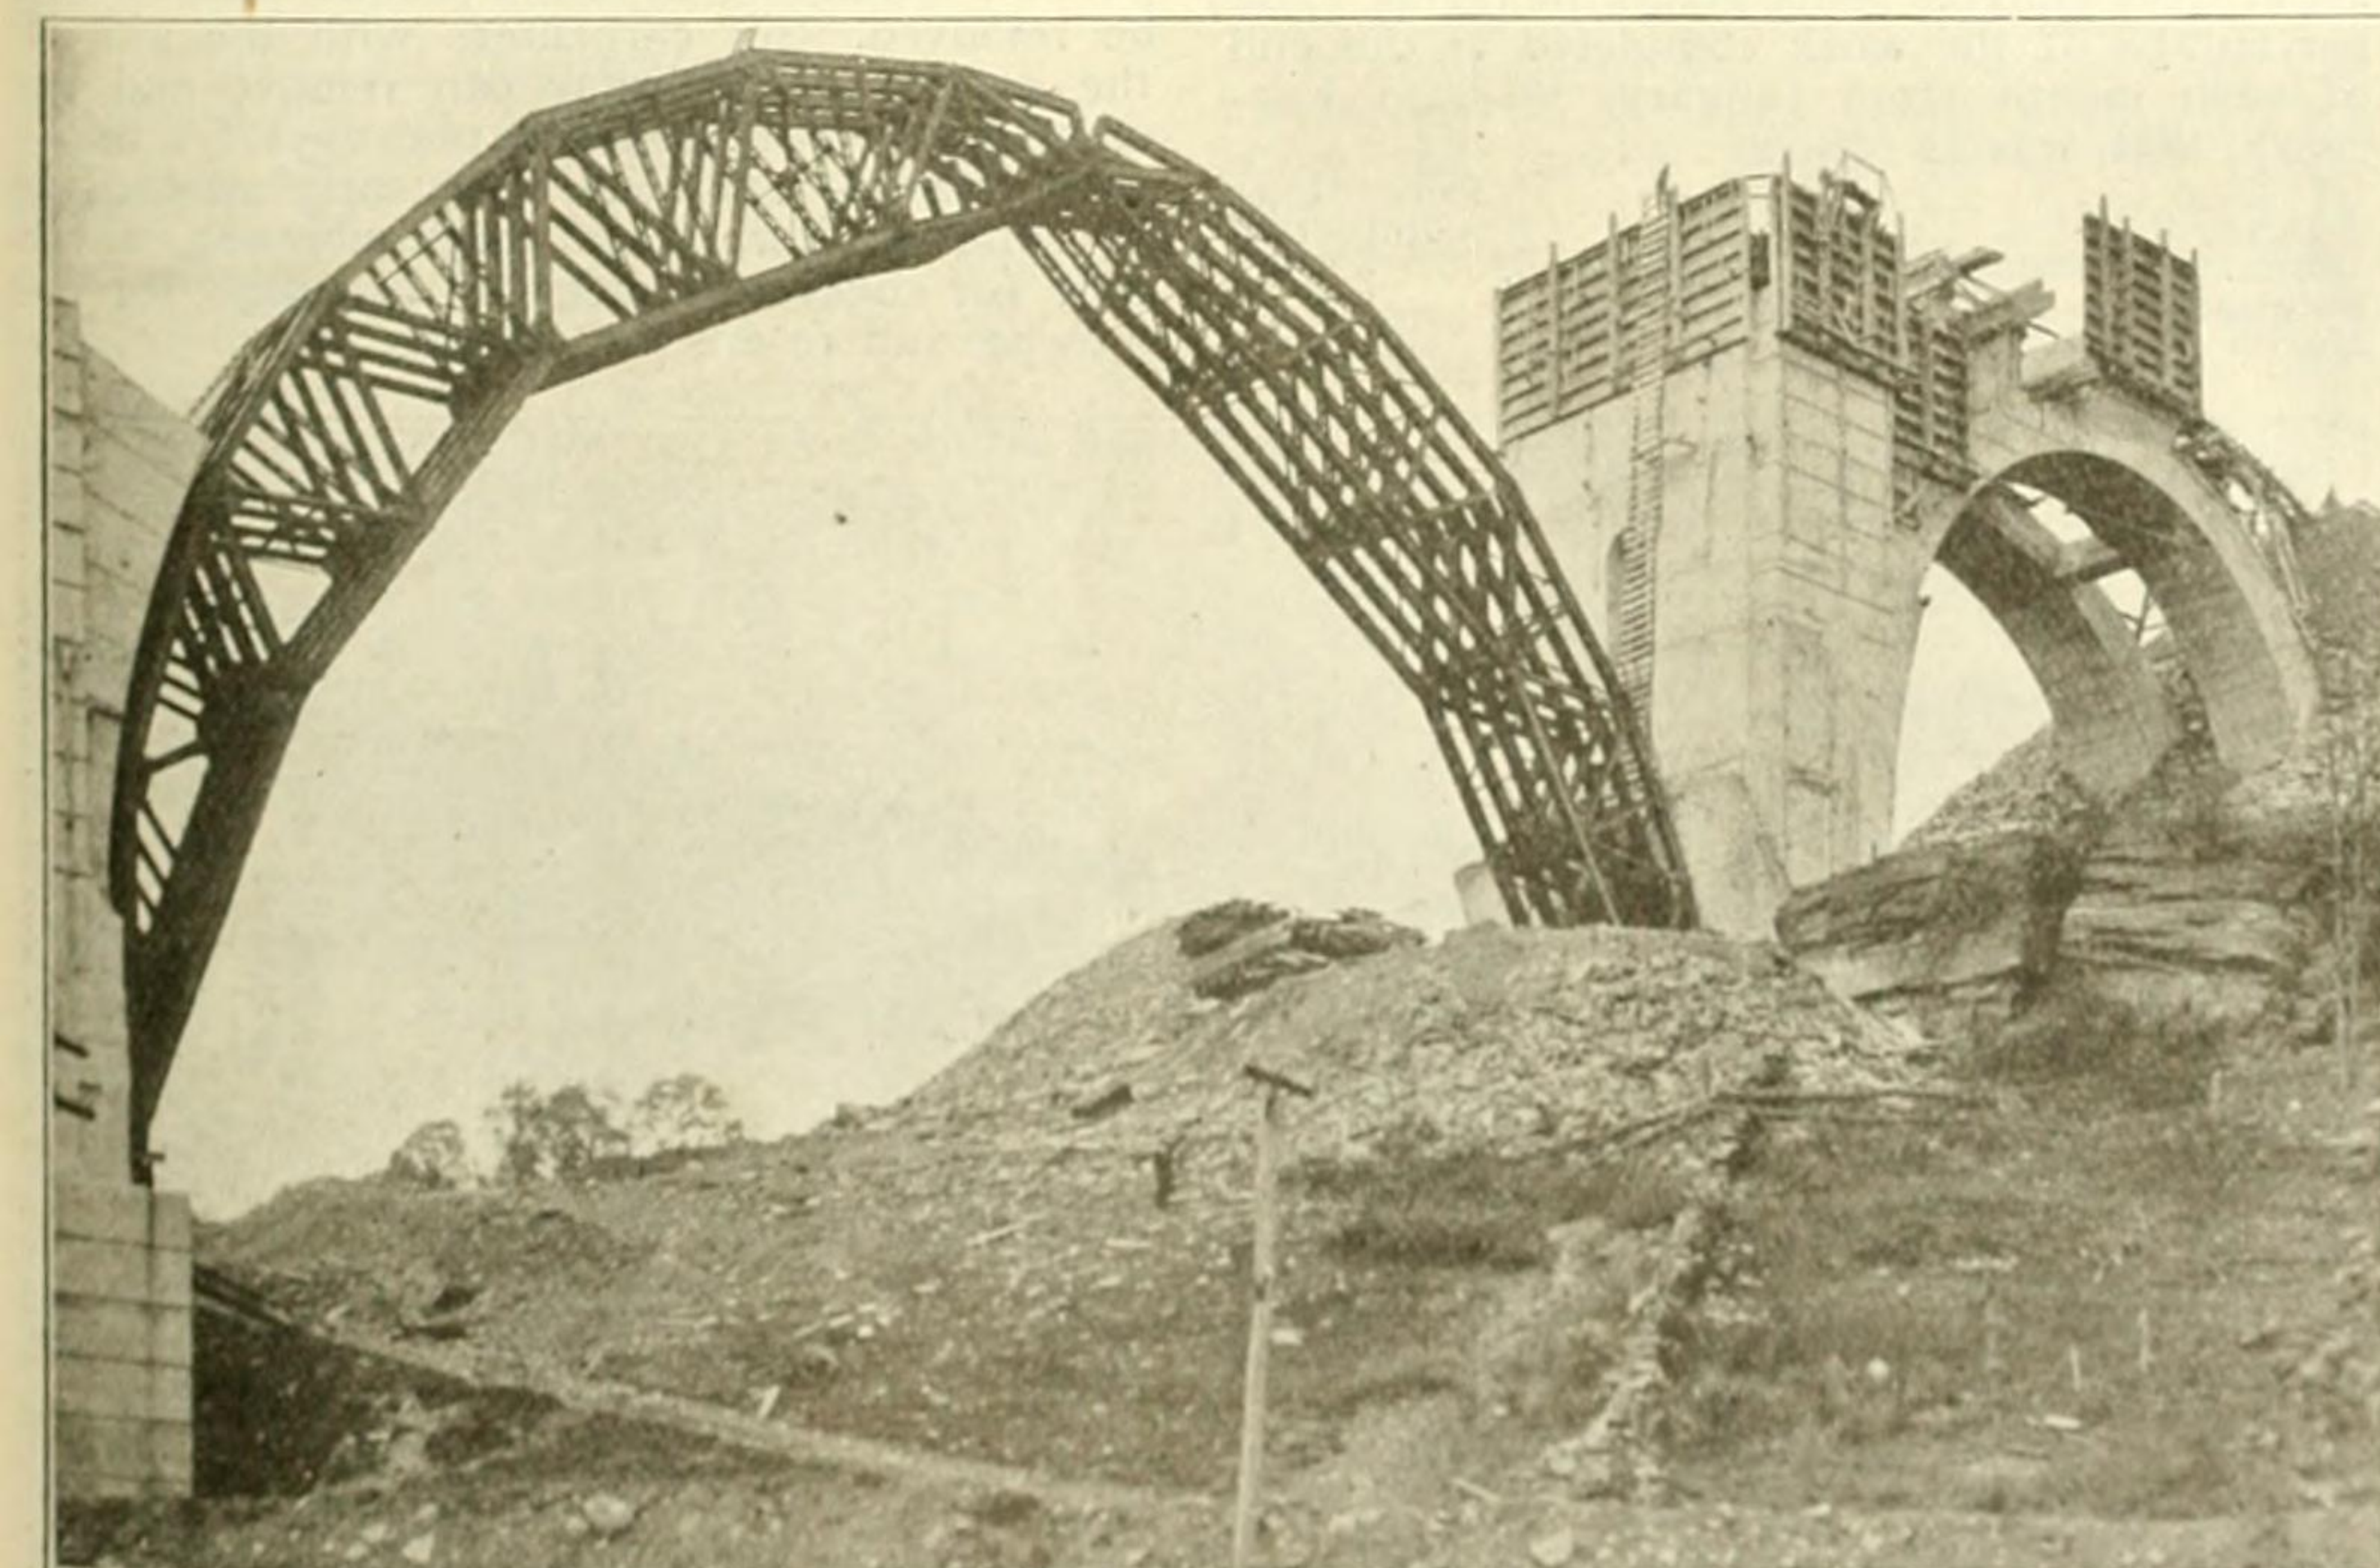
Steel Centering for 180-Ft. Arches—View Also Shows West 100-Ft. Arch in Process of Construction.
